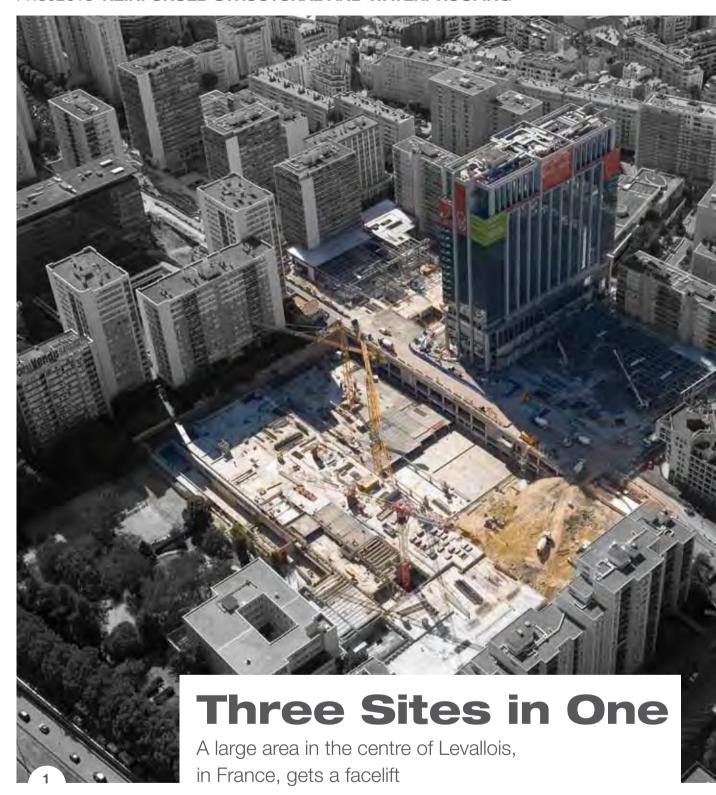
An aerial view of the site PHOTO 2. The Coucellor II Tower while work was being carried out: the structure of the building was completely rebuilt. PHOTO 3. The building once work had been completed.
